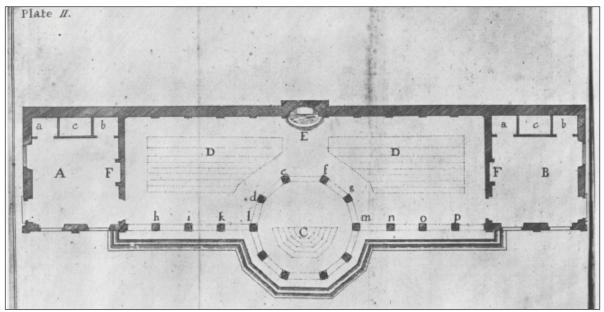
A floor plan of Galilei's Greenhouse shows the similarity in plan of the two houses. A half-decahedral central room has two flanking side rooms, and an apse is located in the center of the building near the rear wall. *Source: Garden History.
